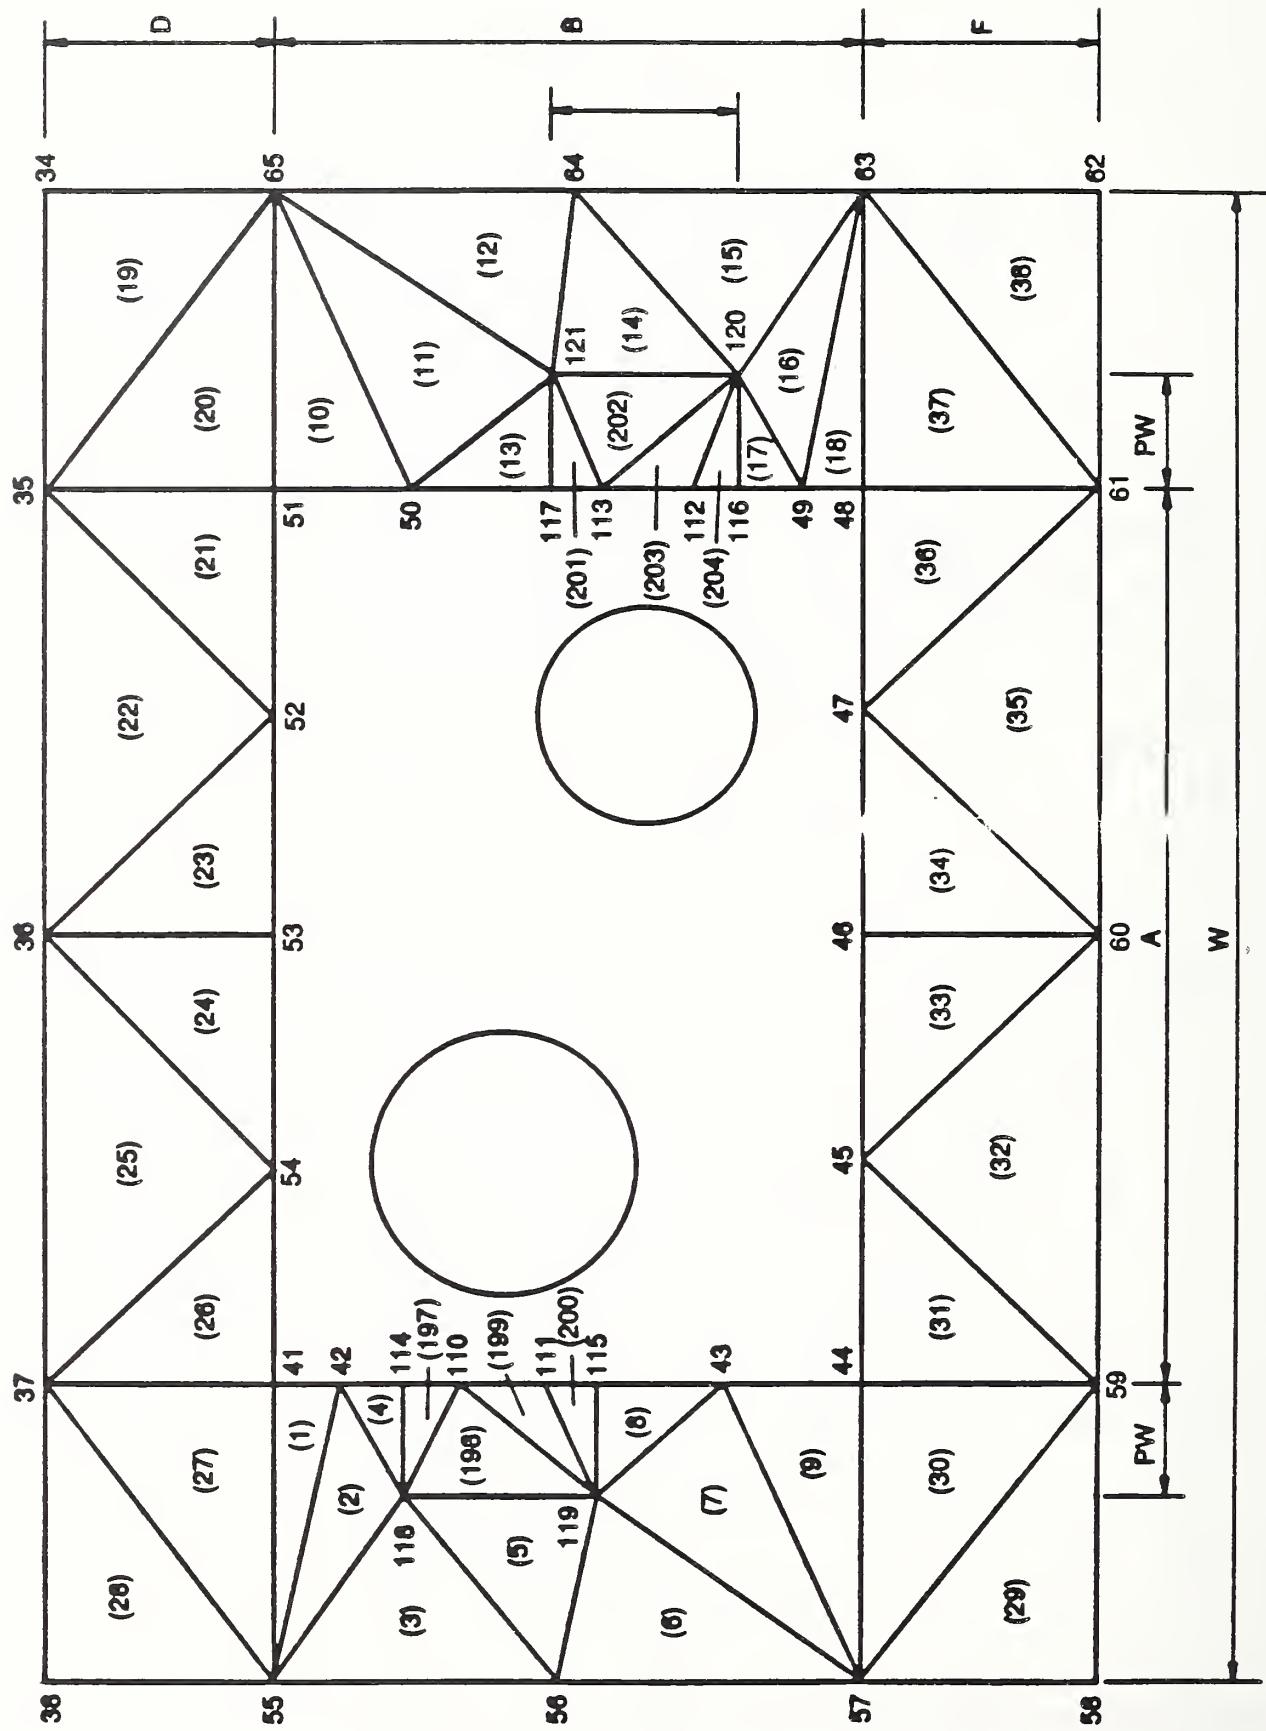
b Finite Element Design for Concrete French Walls, Floor and Cover, and Wall Plates for Horizontal Piping Supports
